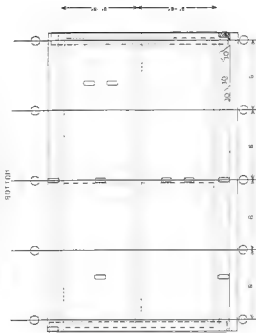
Bottom Cracking Pattern (First Bridge - Test No 6)
